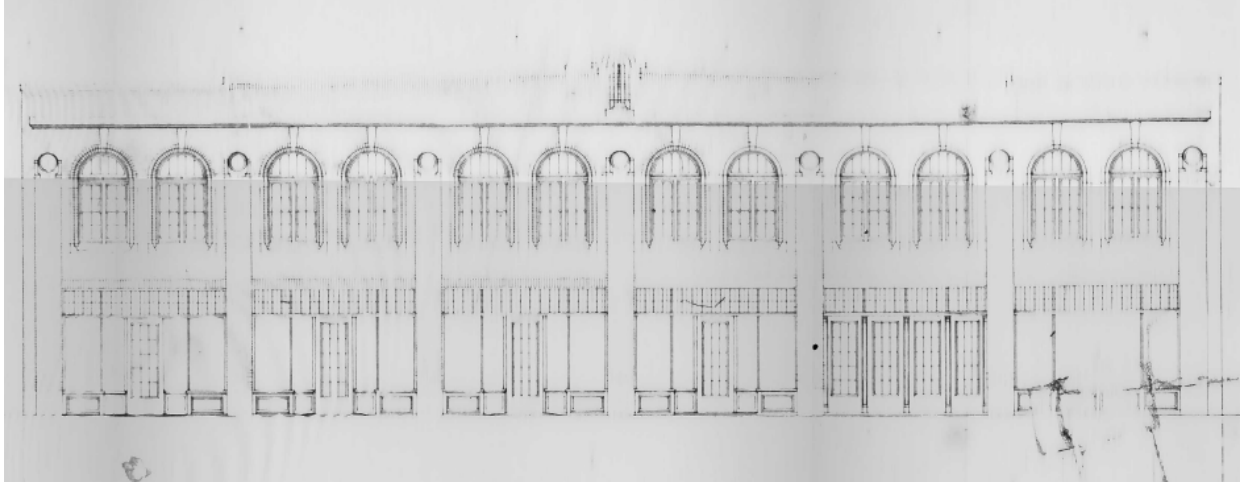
1924 principal (north) elevation drawing of 1497 Queen Street West by James M. Cowan showing original two-storey structure. Note the design of the windows at the second storey (Building Records).
